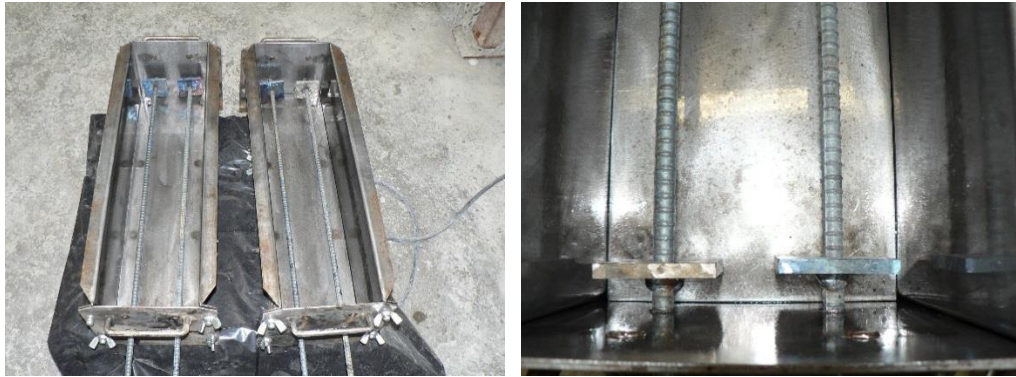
Molds for fatigue corrosion specimens displaying reinforcing steel and welded plates for development.
